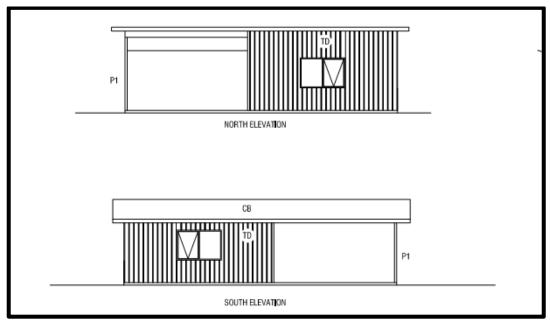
North and south elevations of proposed garage (Designful, 2017)
